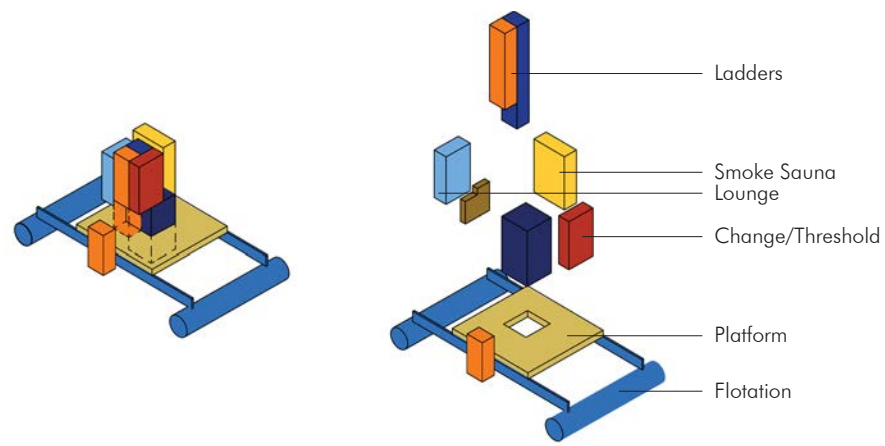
(left) Axonometric program drawing of the contemplation sauna. (right) Exploded axonometric program drawing. Drawing by author.
